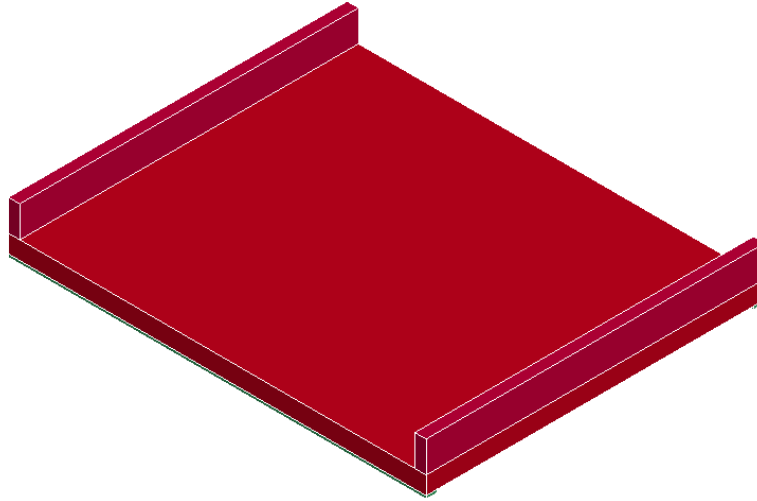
3-D View of Archetype 1 Bridge Model.
